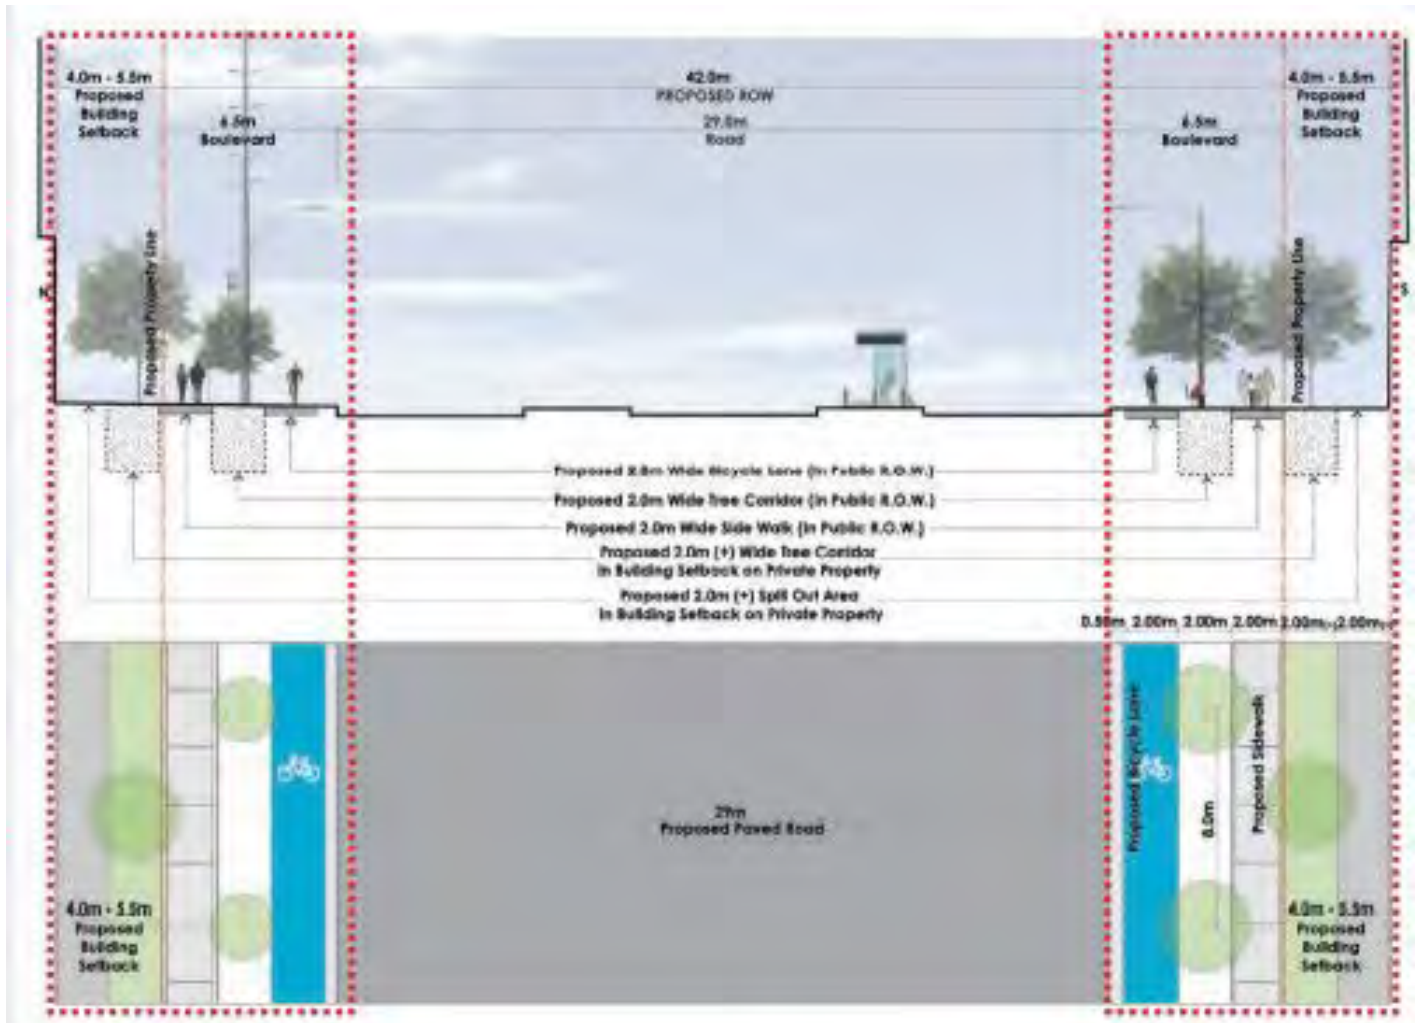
Dundas Connects Master Plan Figure 5-63 – Raised Cycle Track
